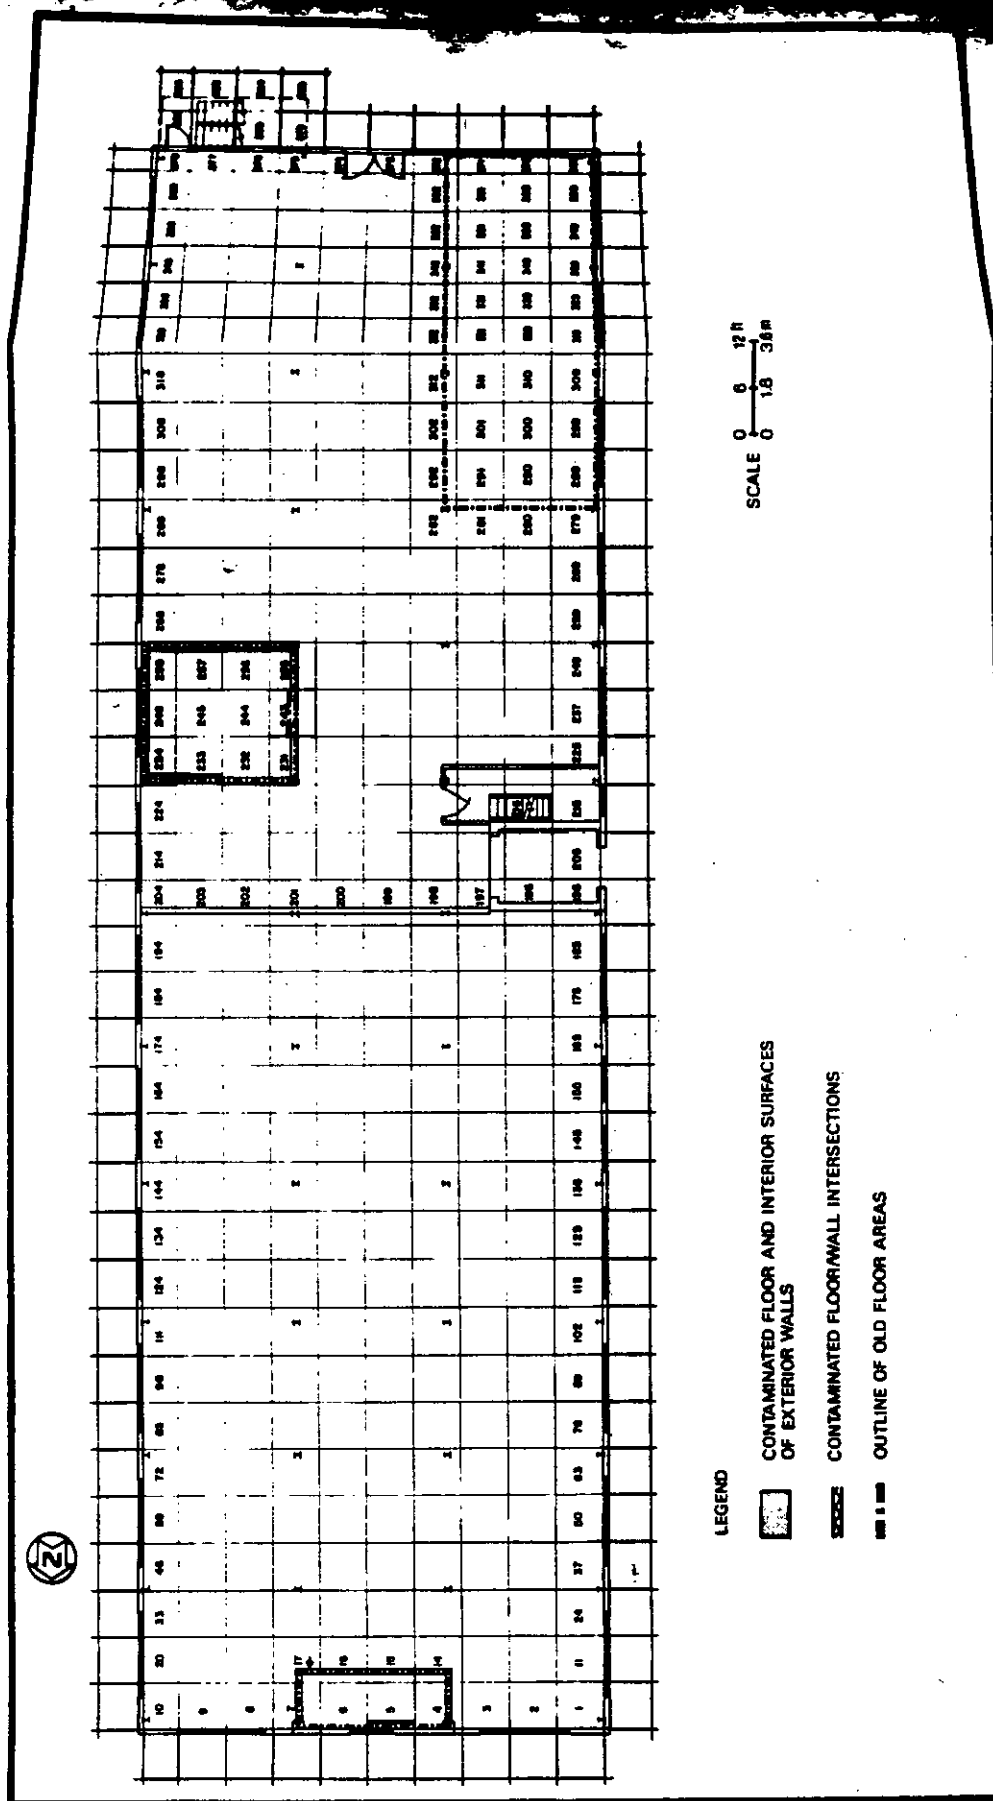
BUILDING 845, THIRD FLOOR: AREAS OF SURFACE CONTAMINATION ON FLOOR, WALLS, AND FLOOR/WALL INTERSECTIONS
